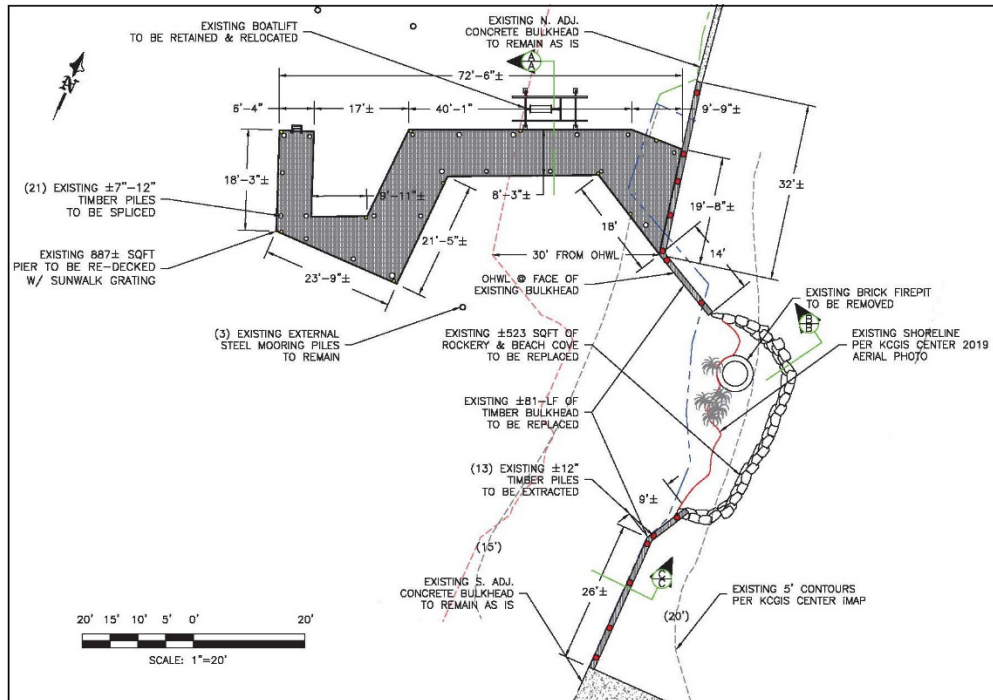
Plan drawings of the existing dock from above (adapted with permission from Waterfront 2021d).
